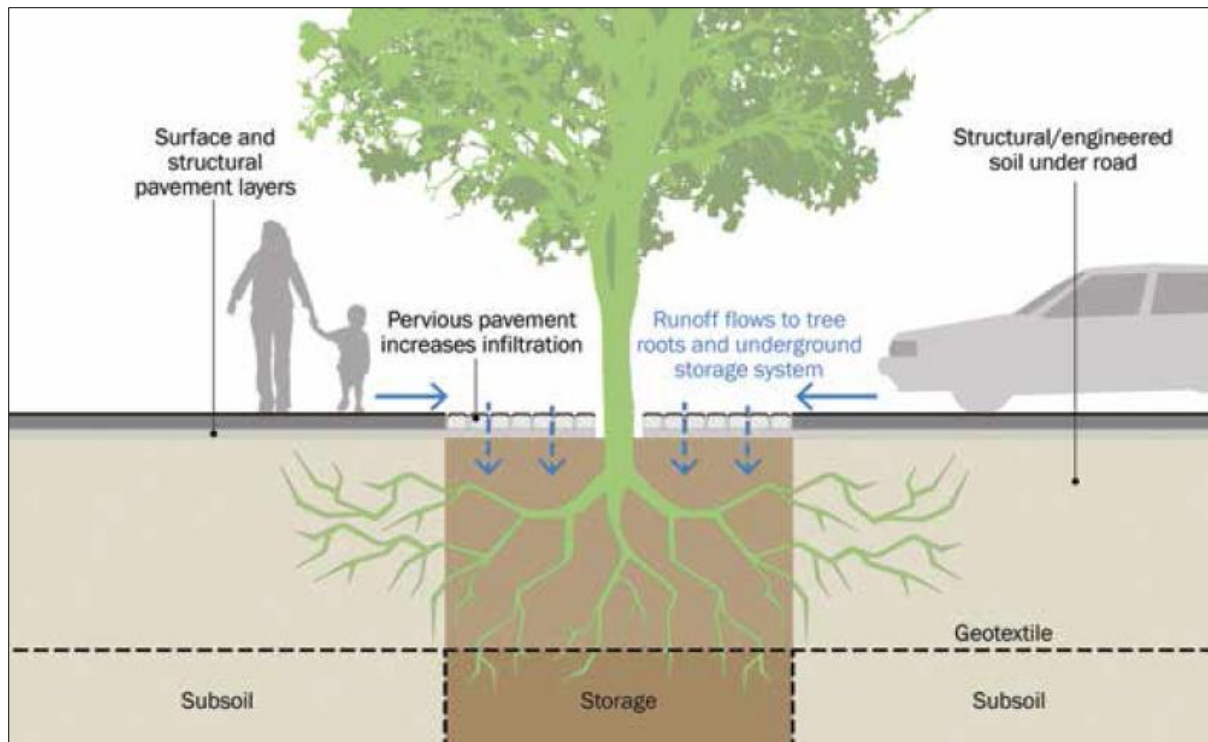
Typical Cross Section of Tree Pit Extract from CIRA SuDs Manual)
